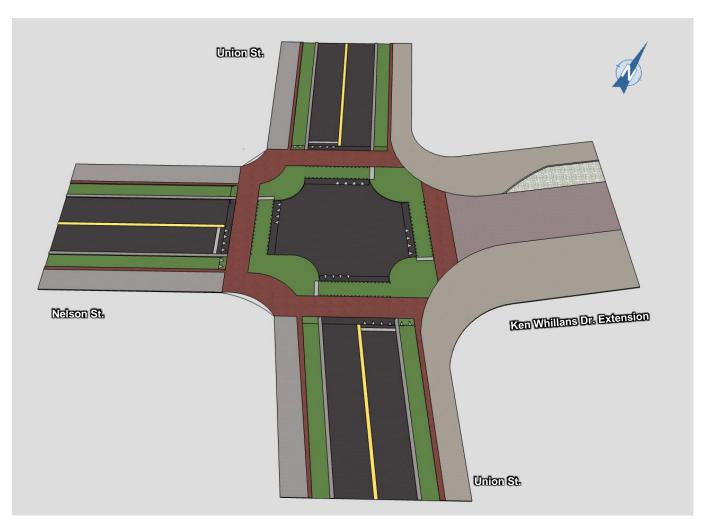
CONCEPTUAL RENDERING OF UNION STREET INTERSECTION AT KEN WHILLANS DRIVE EXTENSION
